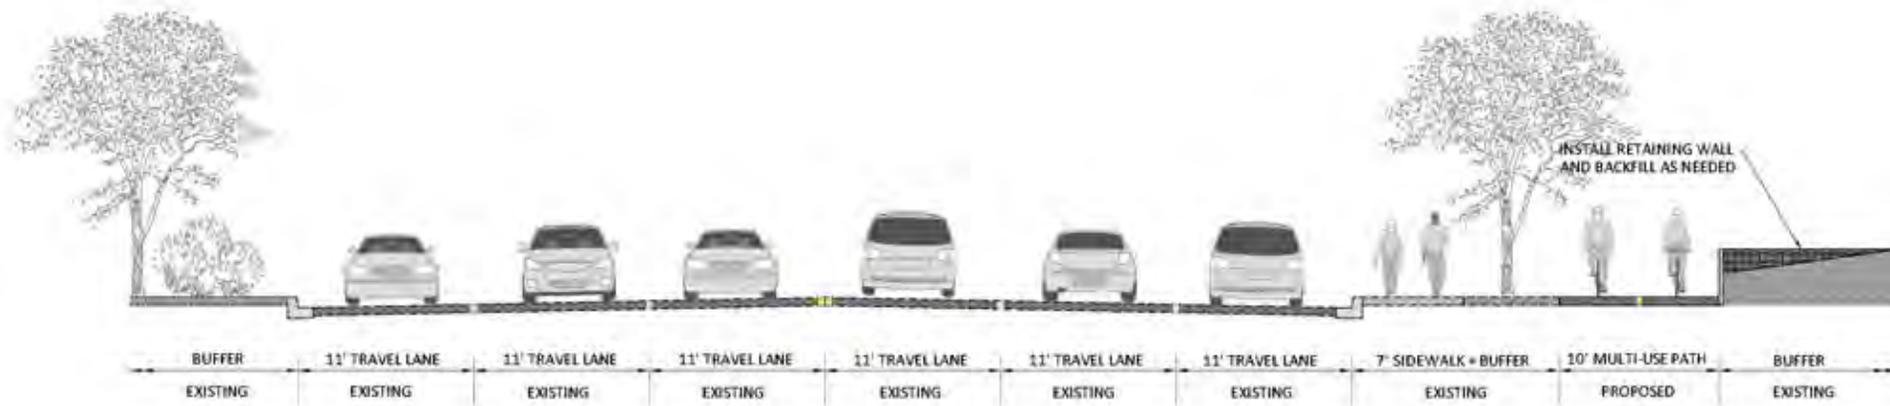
Cross Section West of Brentwood Parkway, Looking East.
